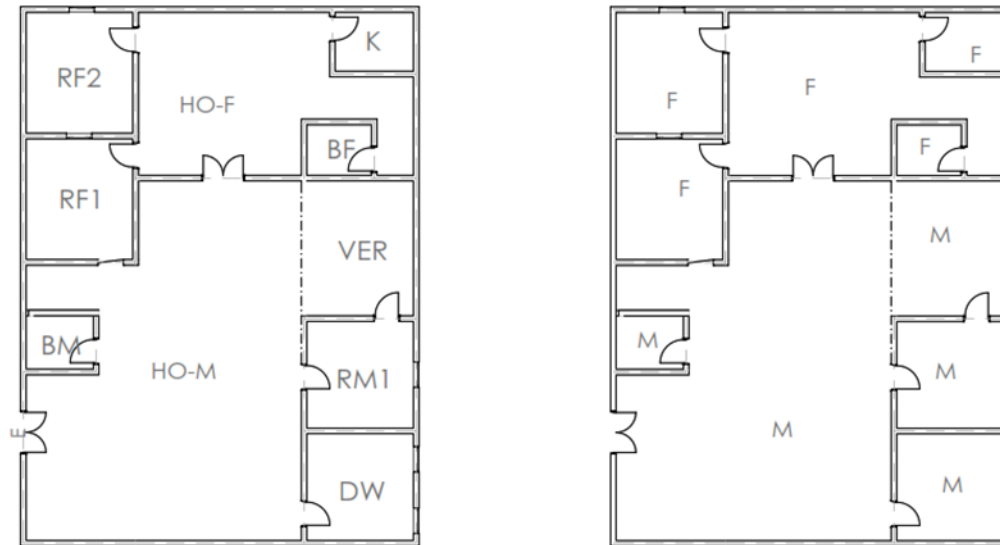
Case 14 - Layout Plan and the Male & Female Domains Layout
